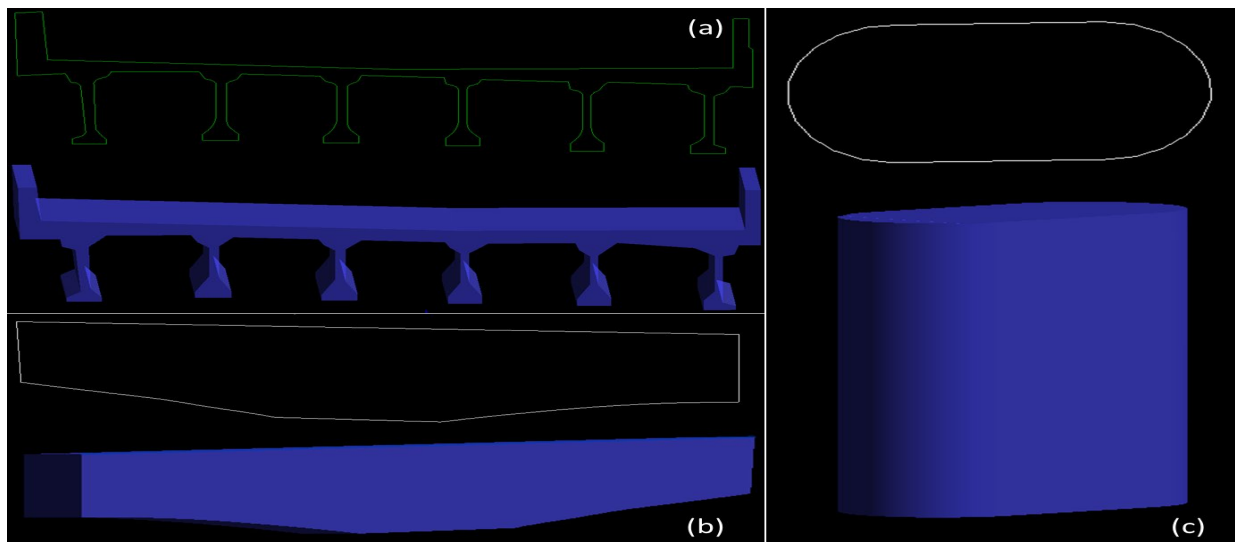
Parametric cross-section and generated BrIM of (a) girder slab; (b) pier cap; and (c) pier.
